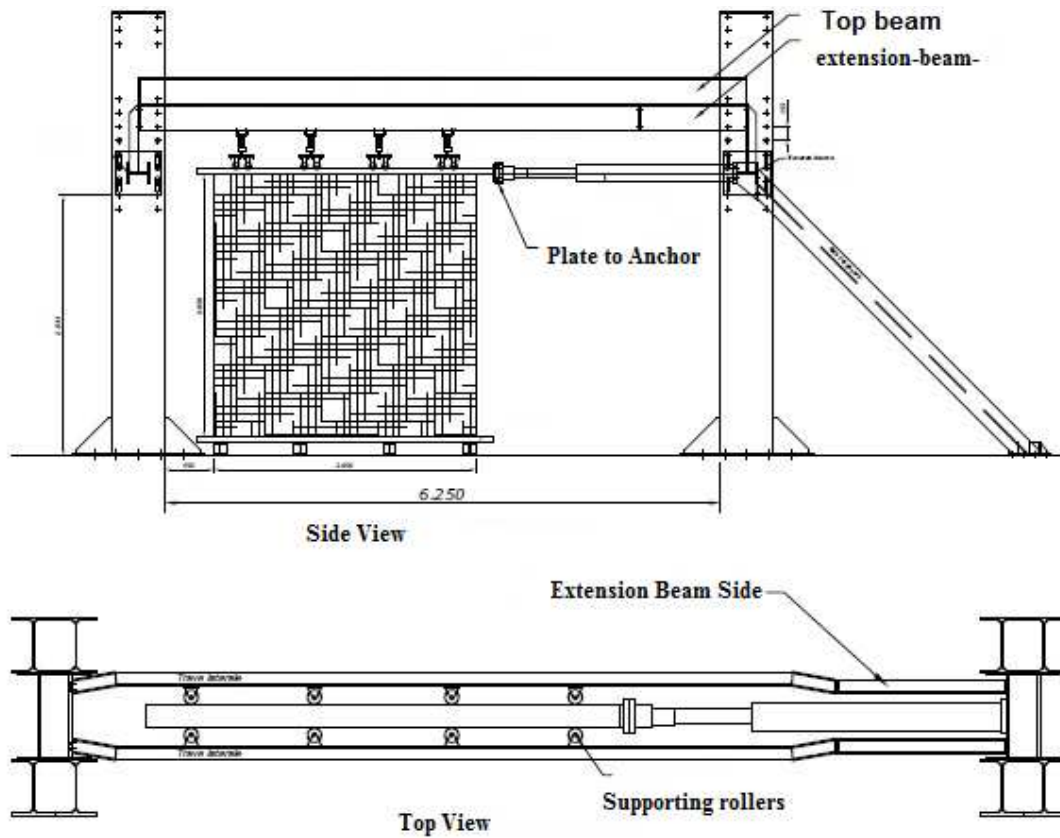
Testing apparatus with the shear wall specimen [30]
